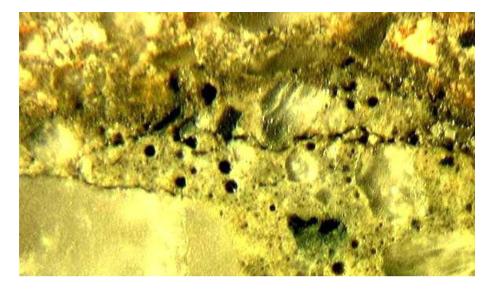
Fractures in Deck Surface Caused by Impact Heads on the Milling Machine
